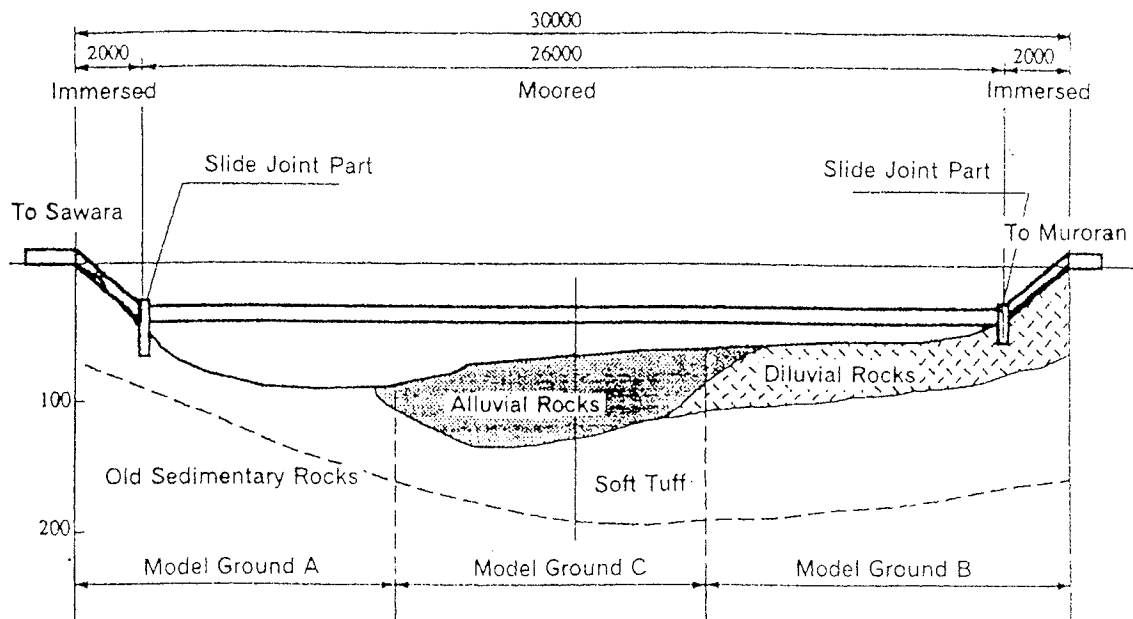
Longitudinal Section of the Funka Bay Submerged Floating Tunnel (unit: m)
